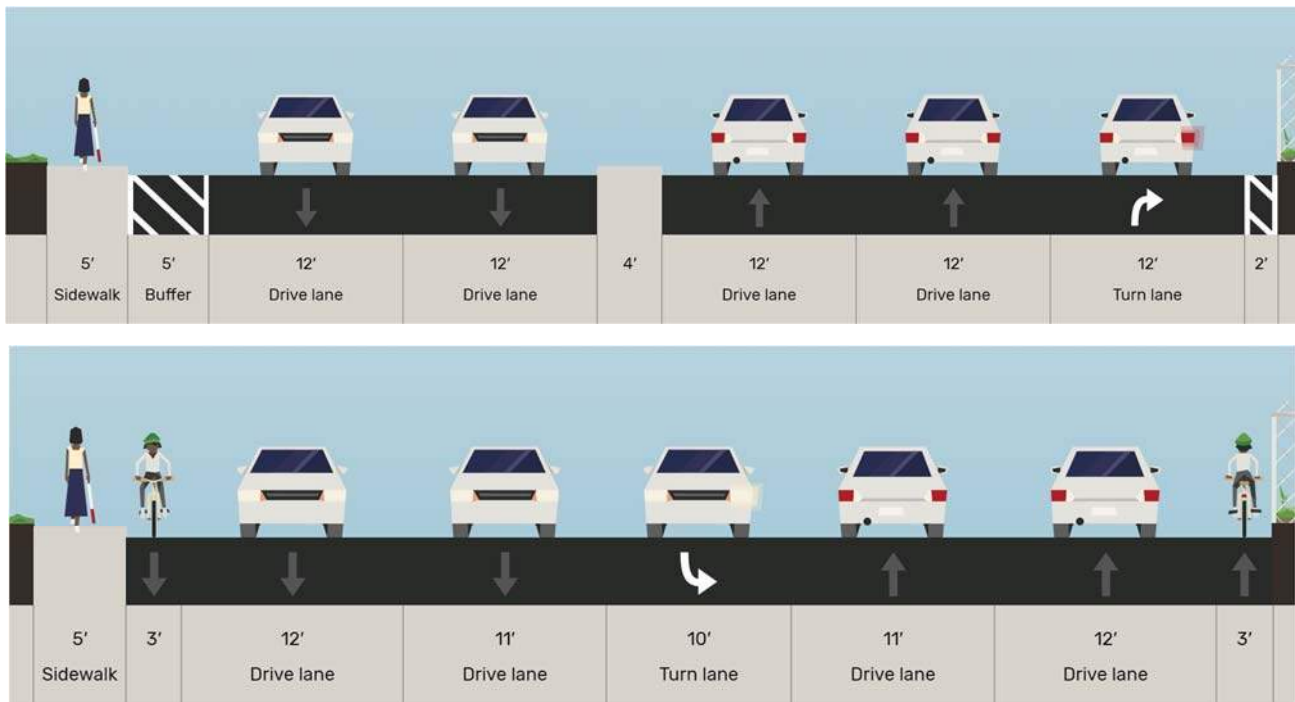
Intersection Typical Section (Top – Looking South; Bottom – Looking North)
